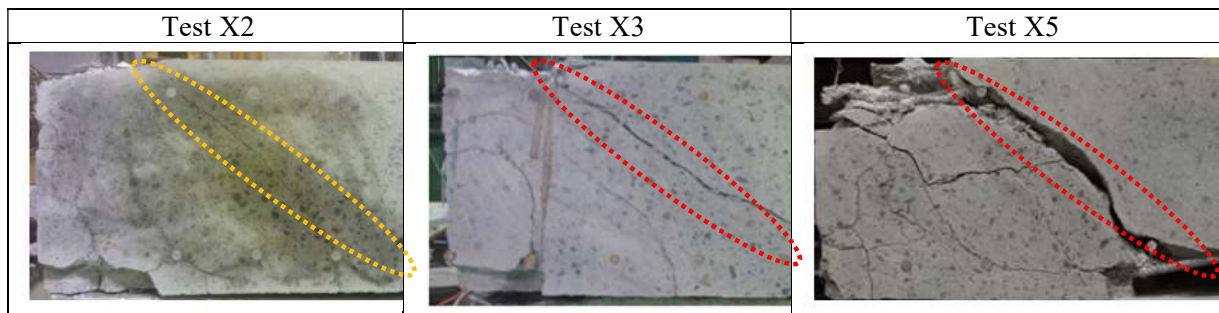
Cross sections of slabs after impact, wider crack observed. The dotted shape that highlights the wider crack is inclined at 37° from the slab plane
